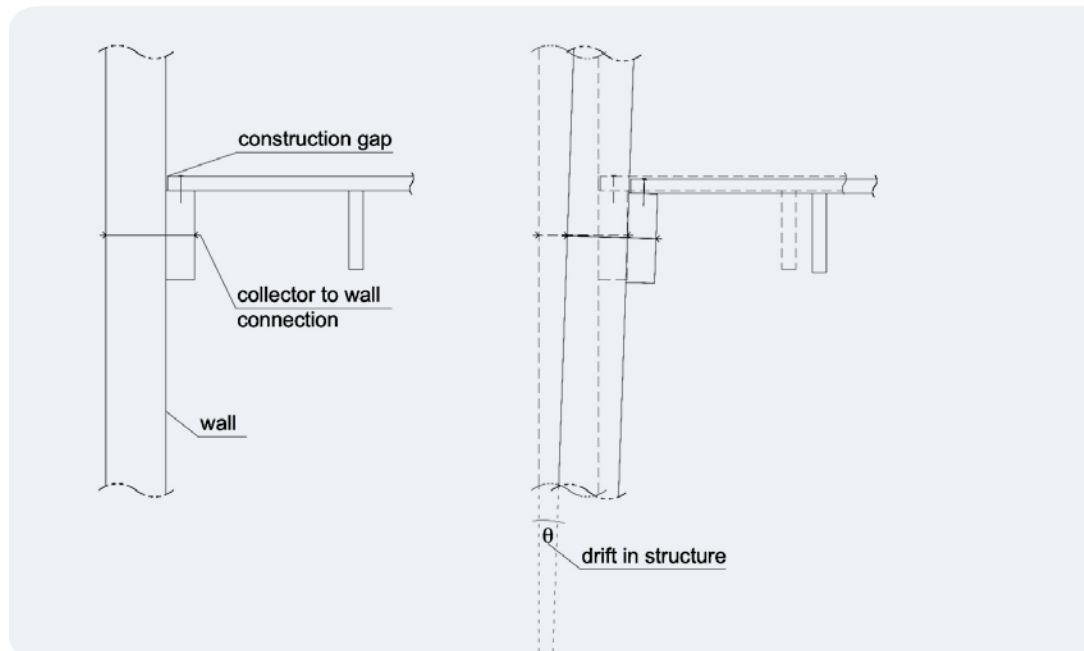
Construction gap between the floor and the wall to allow for rotation: a) undeformed state; b) deformed state.
